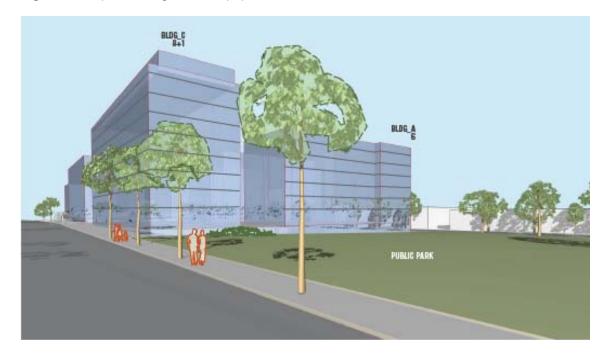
Illustrative building envelopes - View south along Rothschild Avenue.
